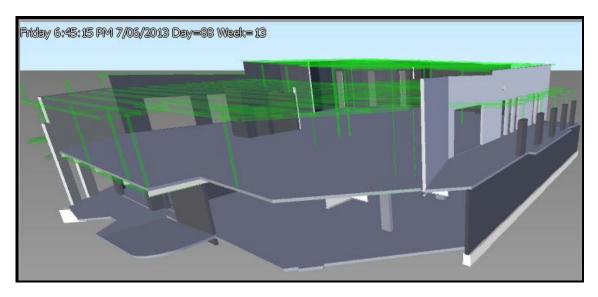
Building Approval Stage (Viewpoint 2) - Works Complete Week 13
